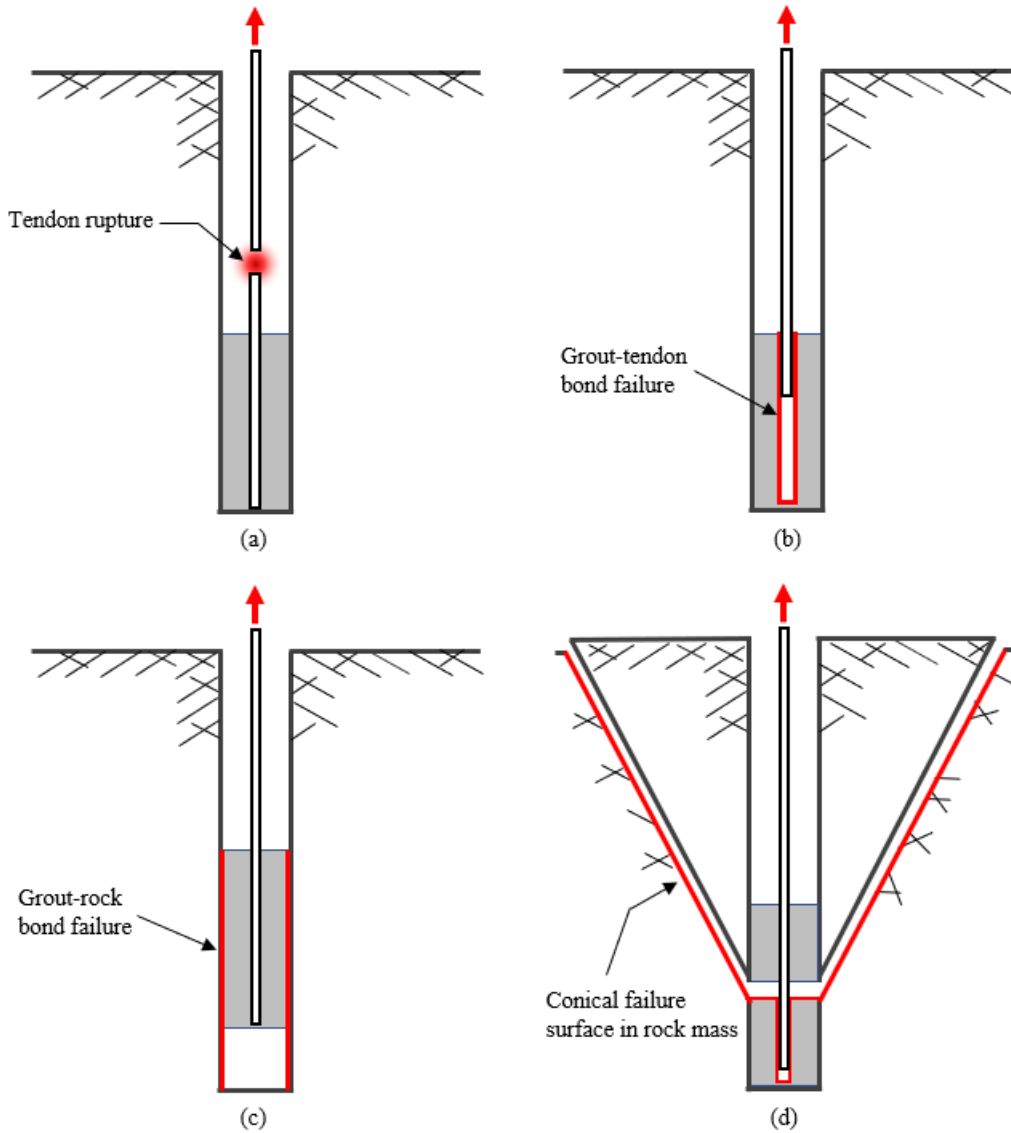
Failure mode A – rupture of the steel tendon; (b) Failure mode B – grout-tendon bond failure; (c) Failure mode C – rock-grout bond failure; and (d) Failure mode D – a conical failure surface in the rock mass
